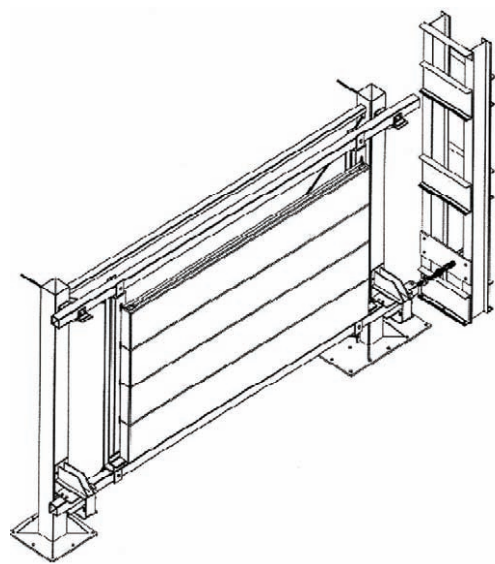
Example test setup for testing horizontally attached cladding panels on the Penn State facility.
